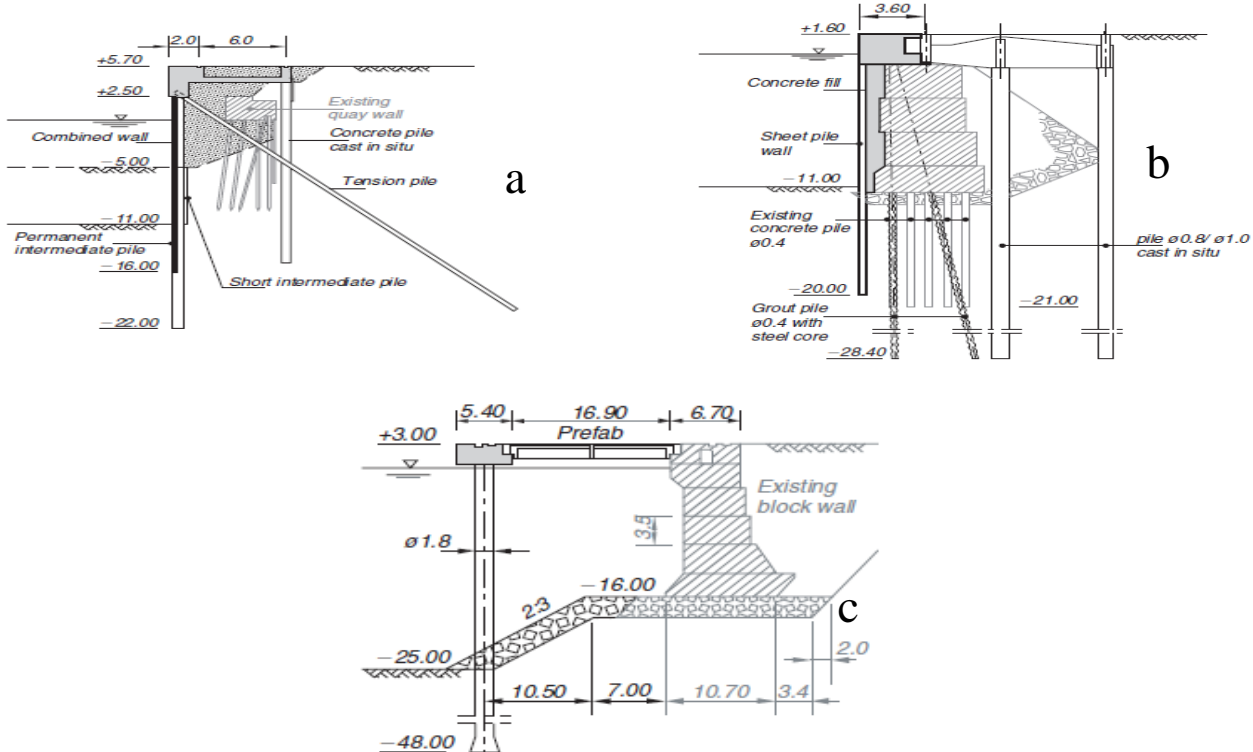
Renovation with piles through the existing structure, Naples, b) Renovation with sheet piling in front of the existing quay, La Spezia, c) Deepening and seaward extension, with open berth, Tarente (Broeken and De Gijt, 2014)
